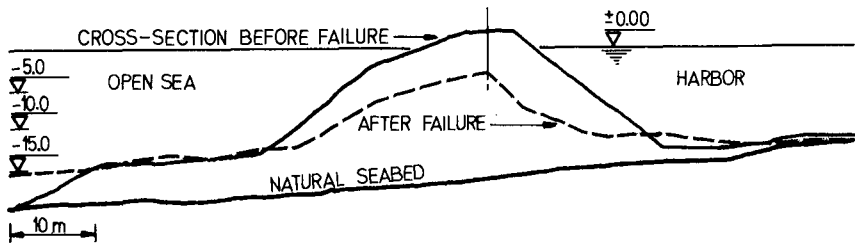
Typical cross-section with outlines before and after the failure
